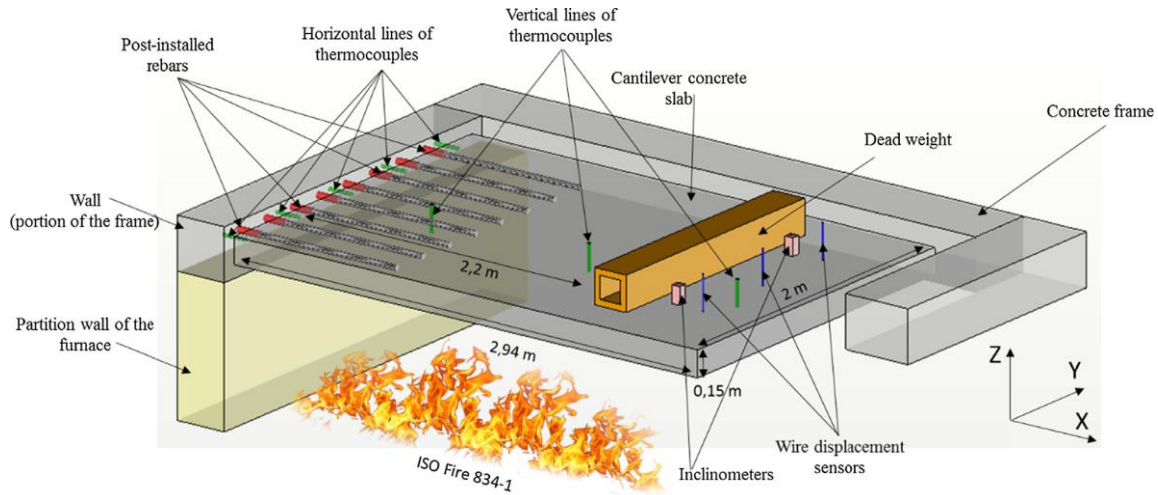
Fire test configuration for slab-wall connection with PIR tested by Lahouar et al., (2017, 2018)
